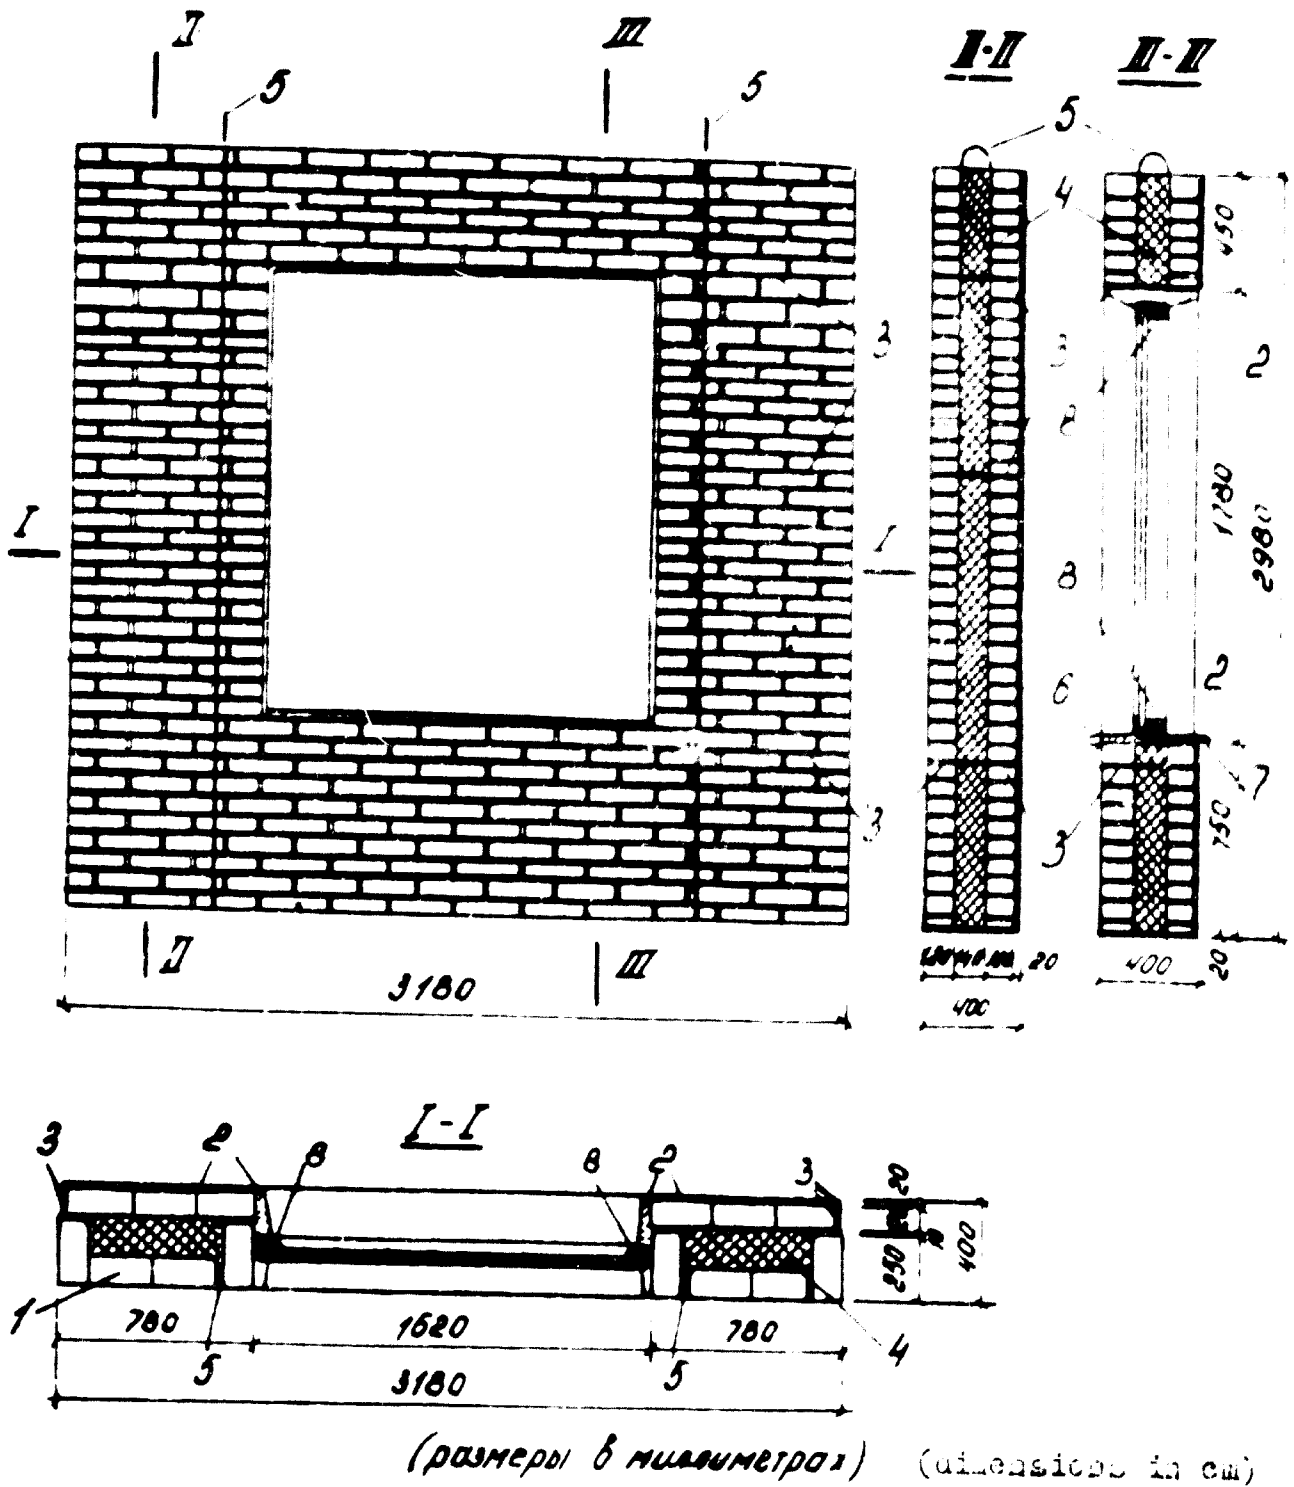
3-Layer Panel Structure with Two Walls of Half a Brick & with Mineral Wool Heat Insulants
